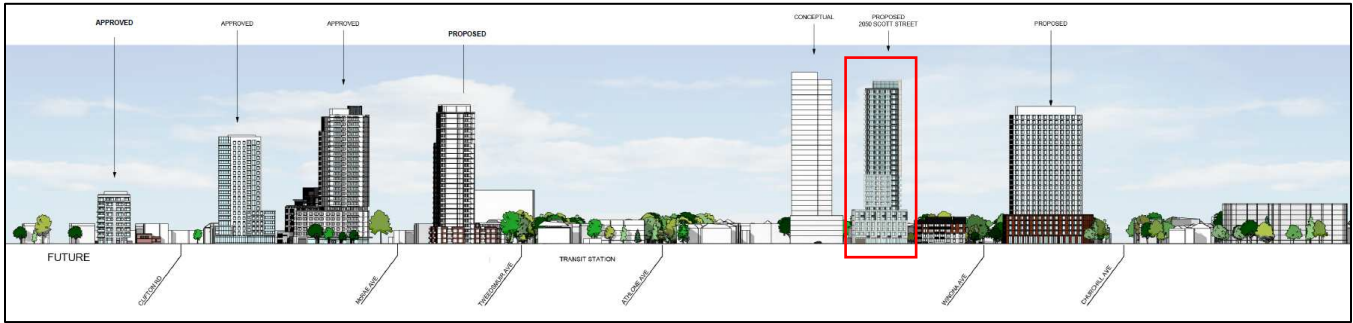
Section view of Scott Street demonstrating current and future building heights.
